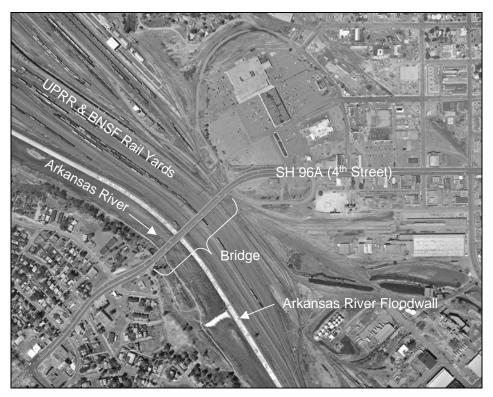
Aerial photograph of existing bridge and surrounding area. Arkansas River flows from left to right in the photograph.
